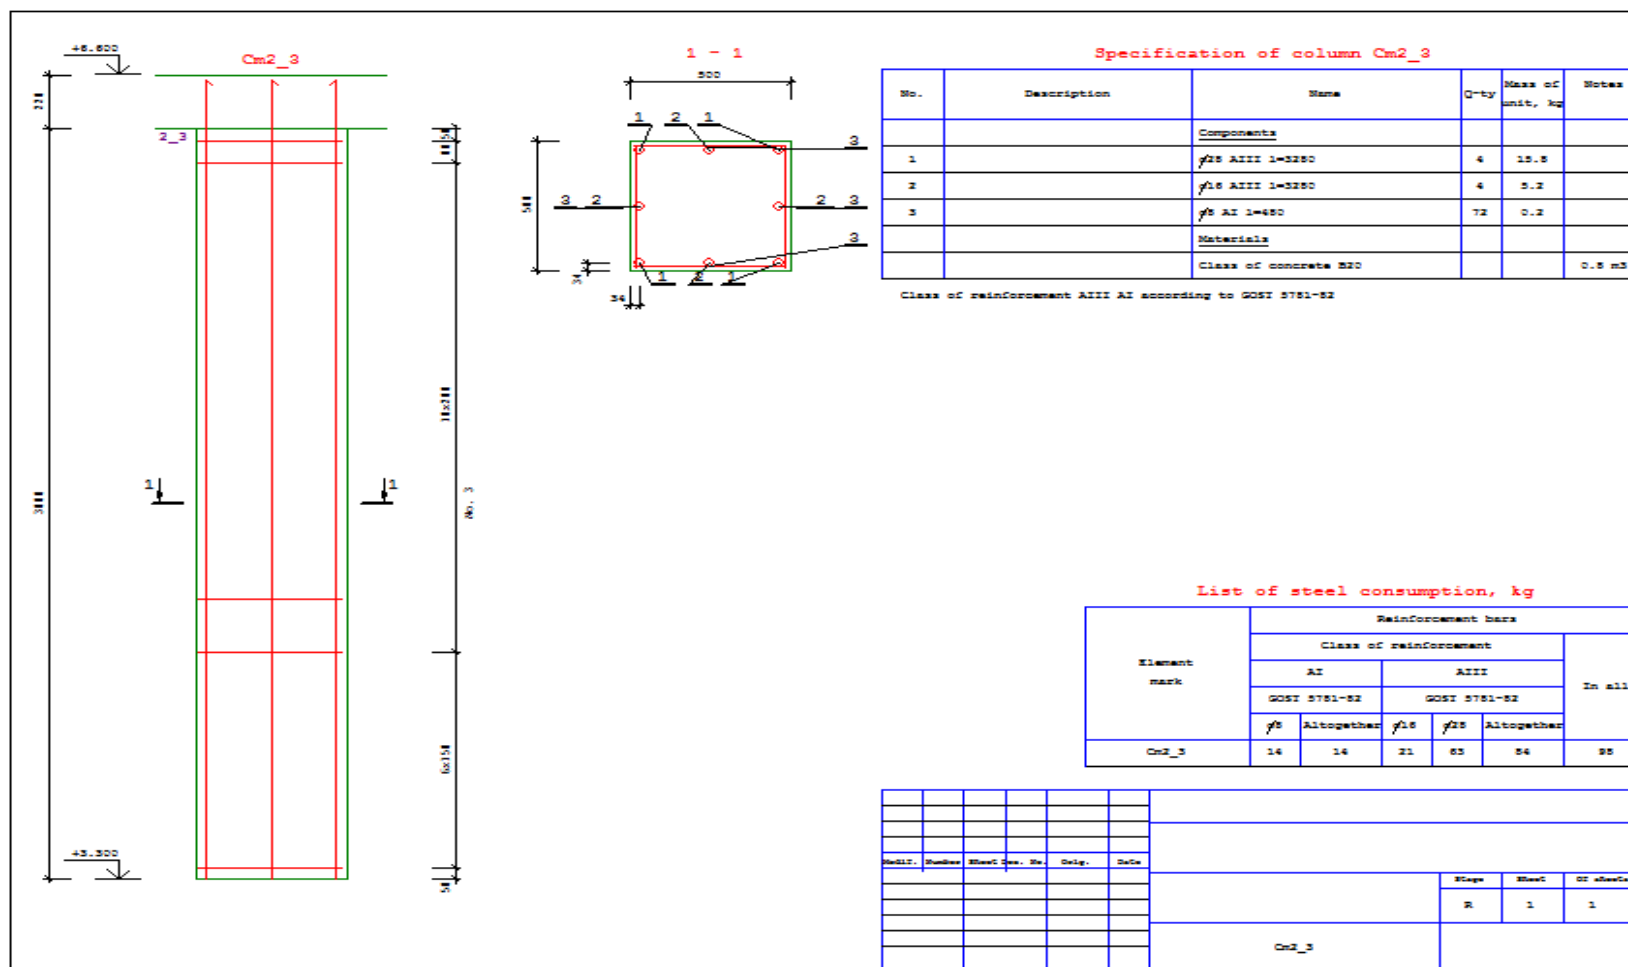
Variant of a building with a slab floor. Column K2-3. Working project drawings
